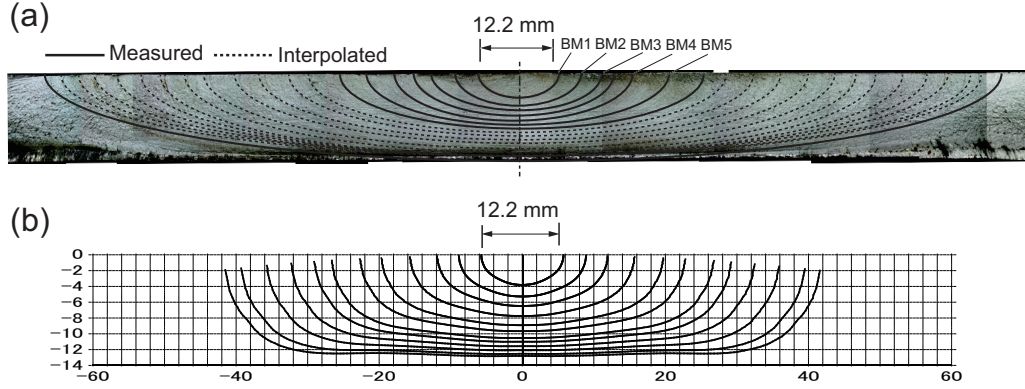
Cross-section of the fracture surface at saddle location.
